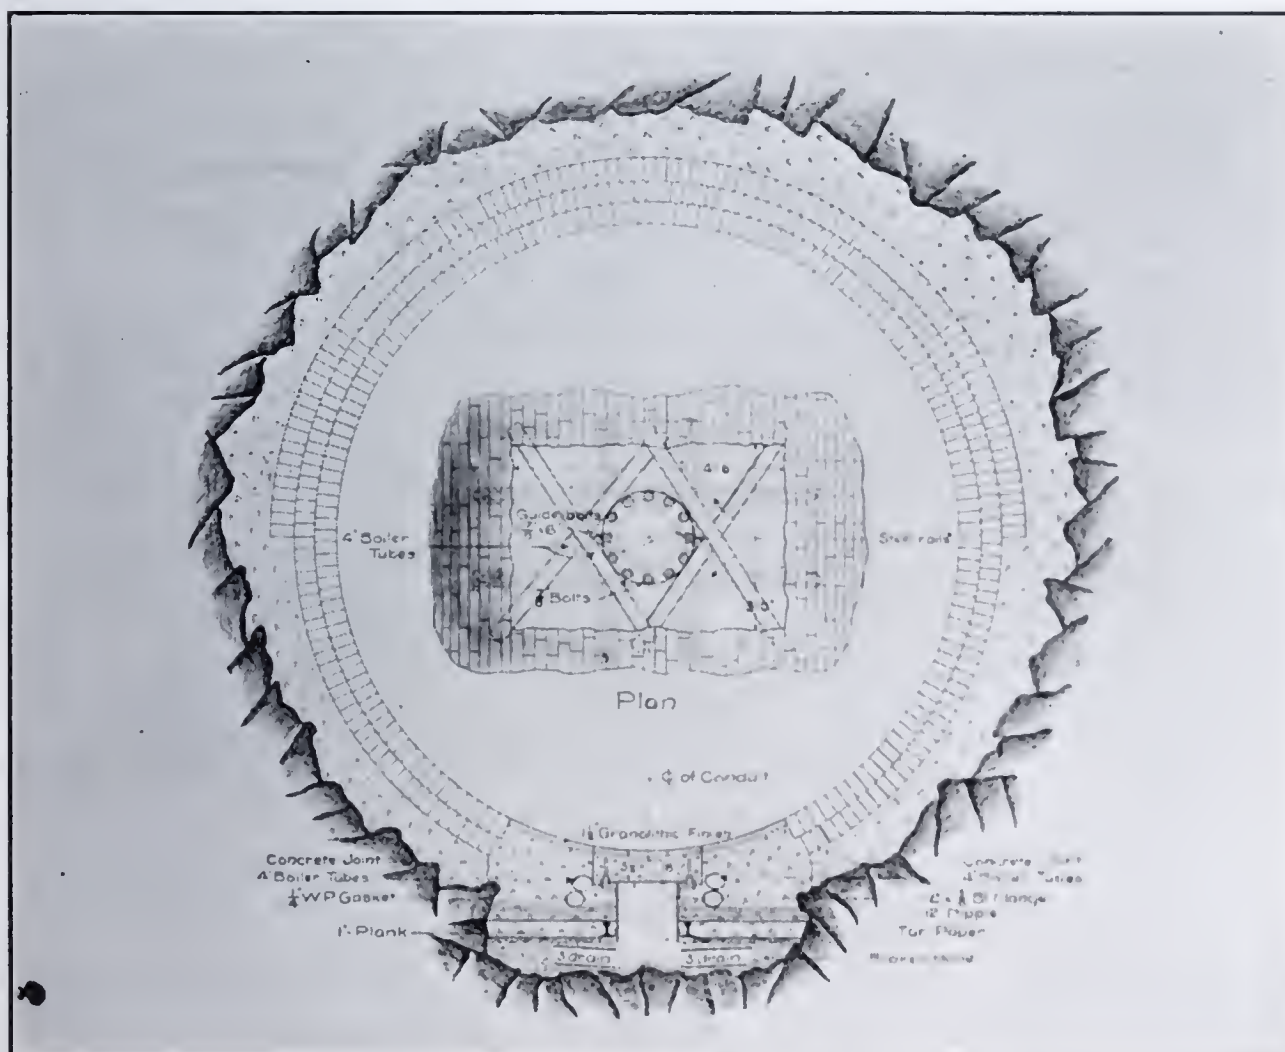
PLATE XXX.—METHOD OF CLOSING SUMP, SHAFT NO. 2.
